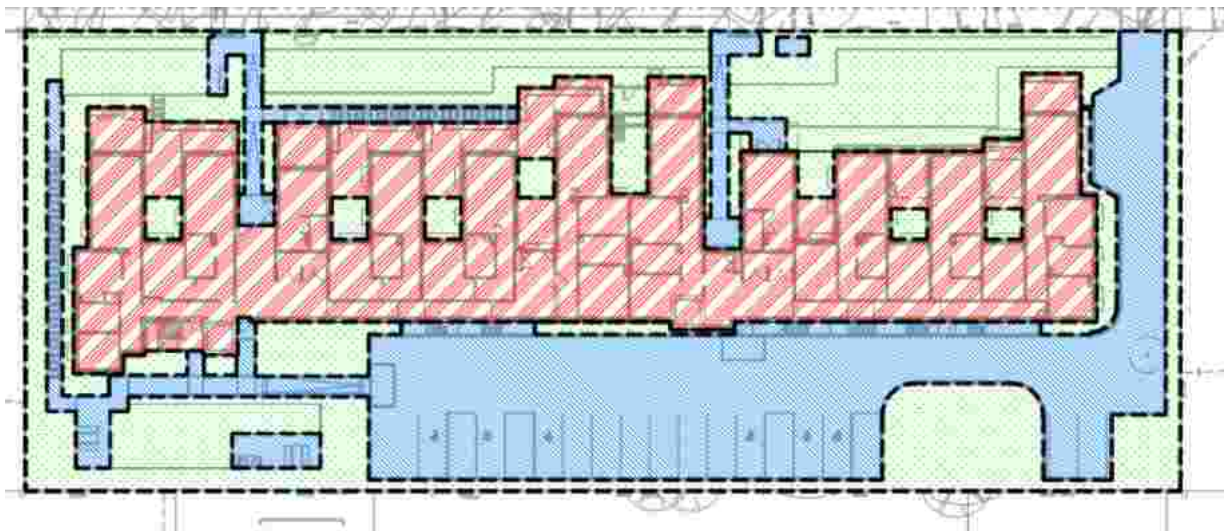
Post-development stormwater catchment plan. Henry and Hymas 2024
